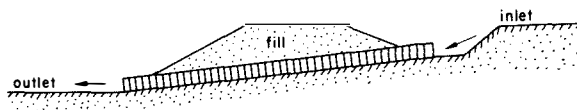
Culvert installed with too much fall. Because of erosion at the bottom, culvert will not last as long as it should.
